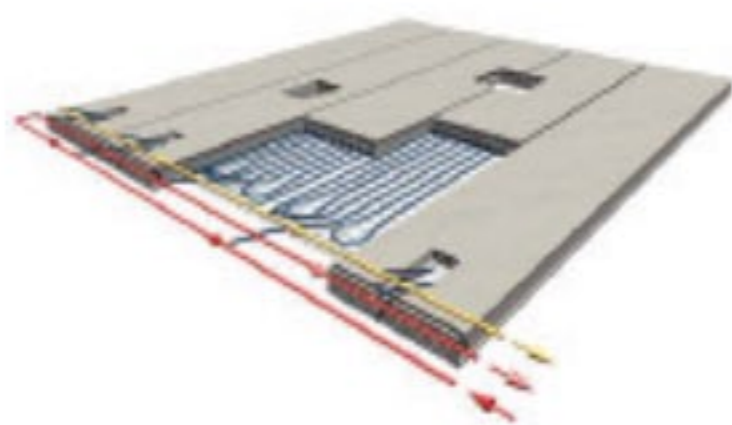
Incorporation of floor heating ducts in hollow core slabs to activate thermal mass
